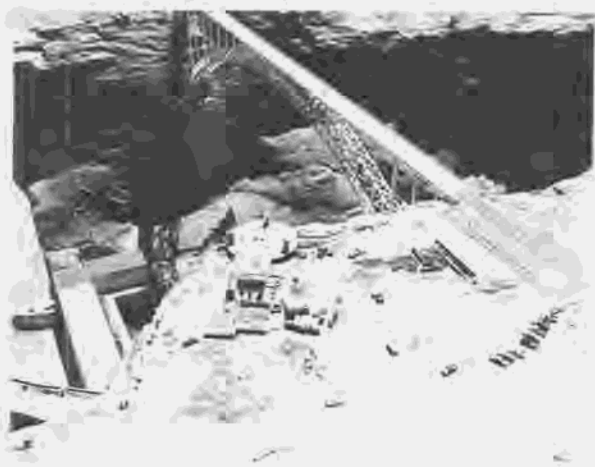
Aerial view looking east over visitor center construction. P557-420-12274, May 24, 1966.
